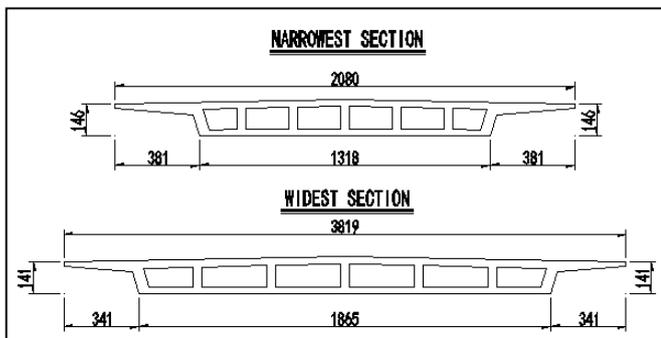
FIGURE V. THE BOTH END SECTIONS OF WIDENING BOX GIRDER (UNIT: CM)
